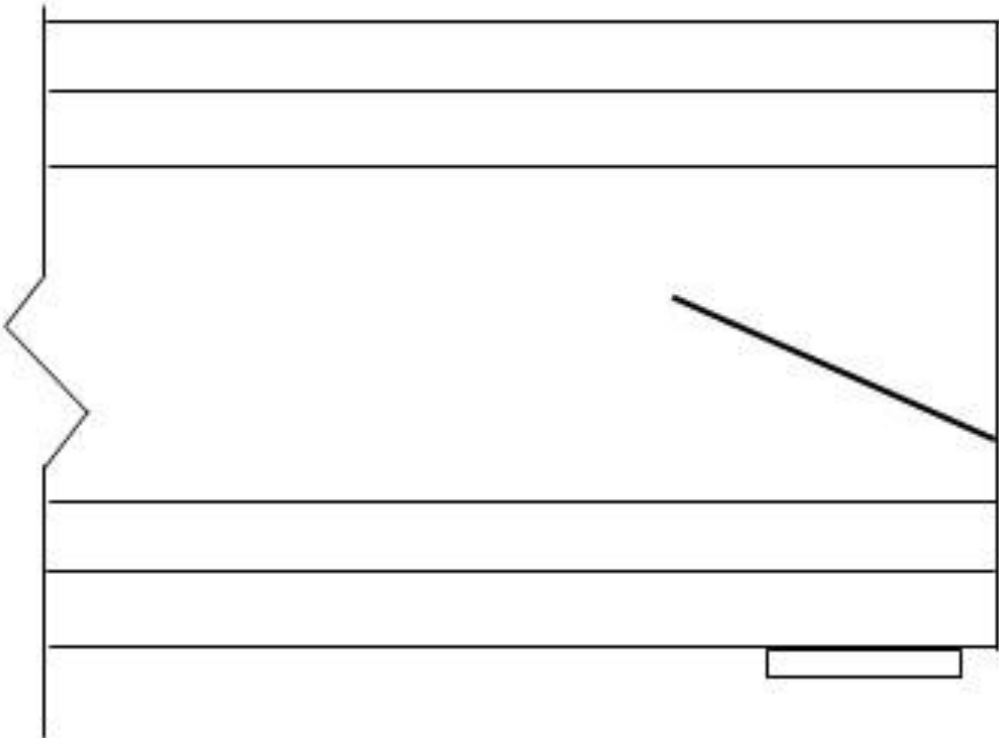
Crack diagram for girder 2nd from east side, east face, north abutment (#1829).
